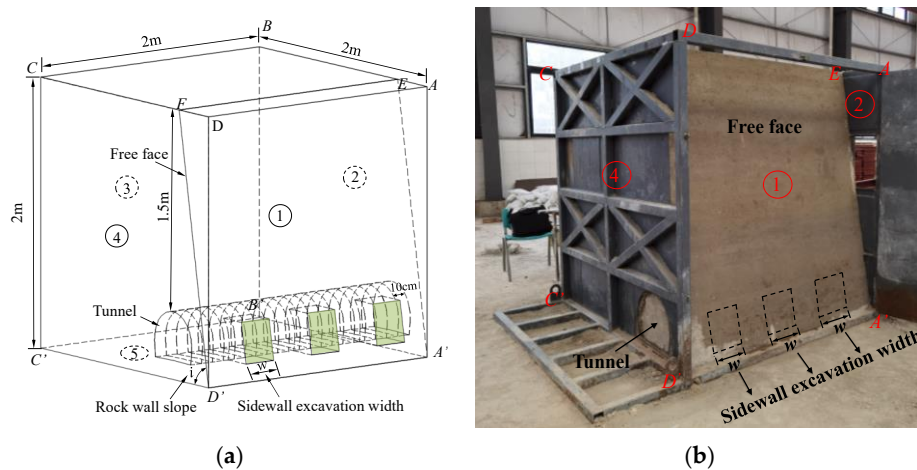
Model test platform. (a) Schematic diagram of hanging tunnel model; (b) the PAM of hanging tunnel.
